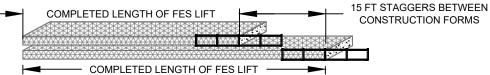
STAGGER FABRIC OVERLAPS A MINIMUM OF 15 FT BETWEEN LIFTS.
